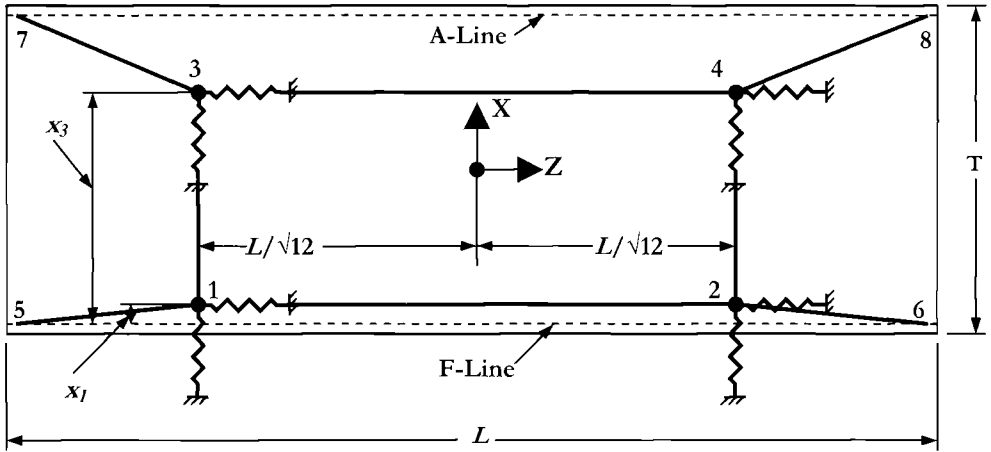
Locations of SuperPiles for a Wharf Segment (Plan View)
